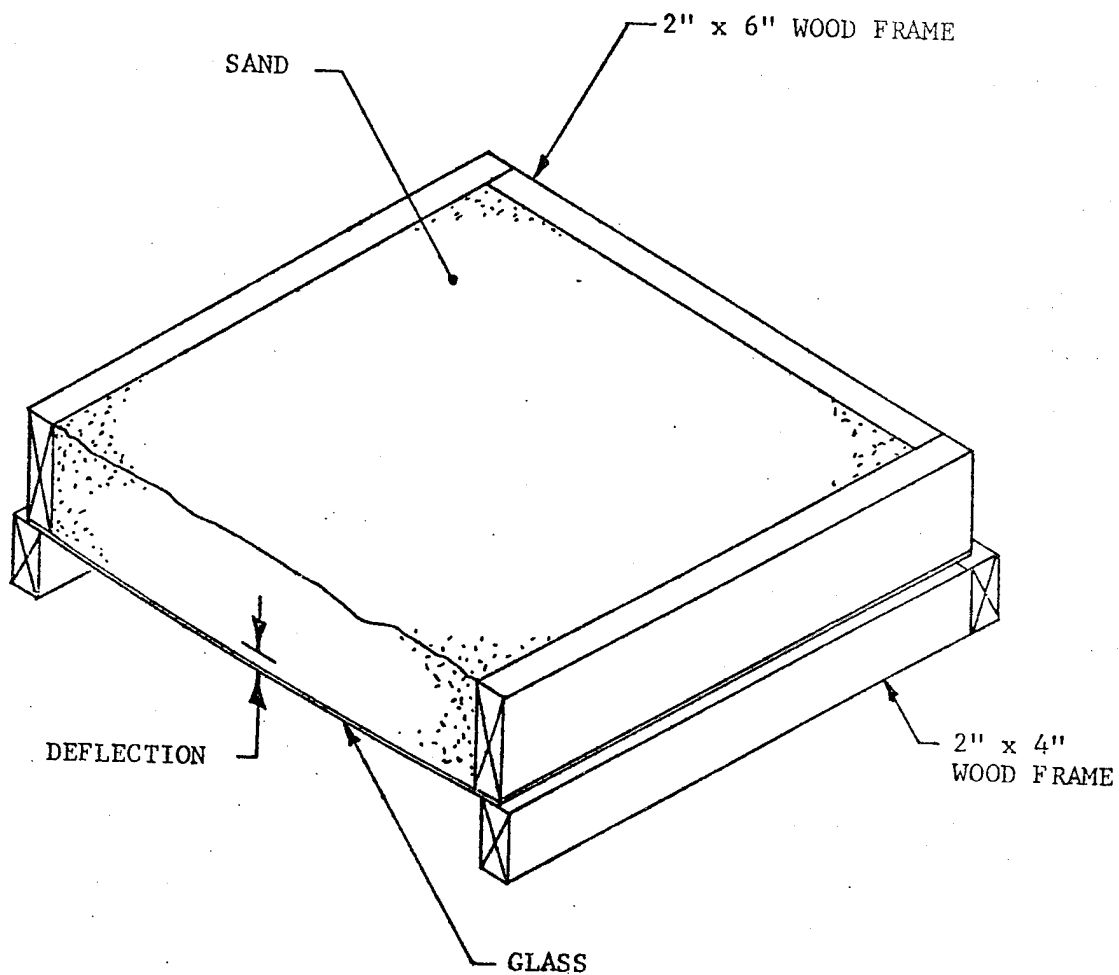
Sketch of Test Setup for Deflection Tests of Glass Under Uniform Static Load
